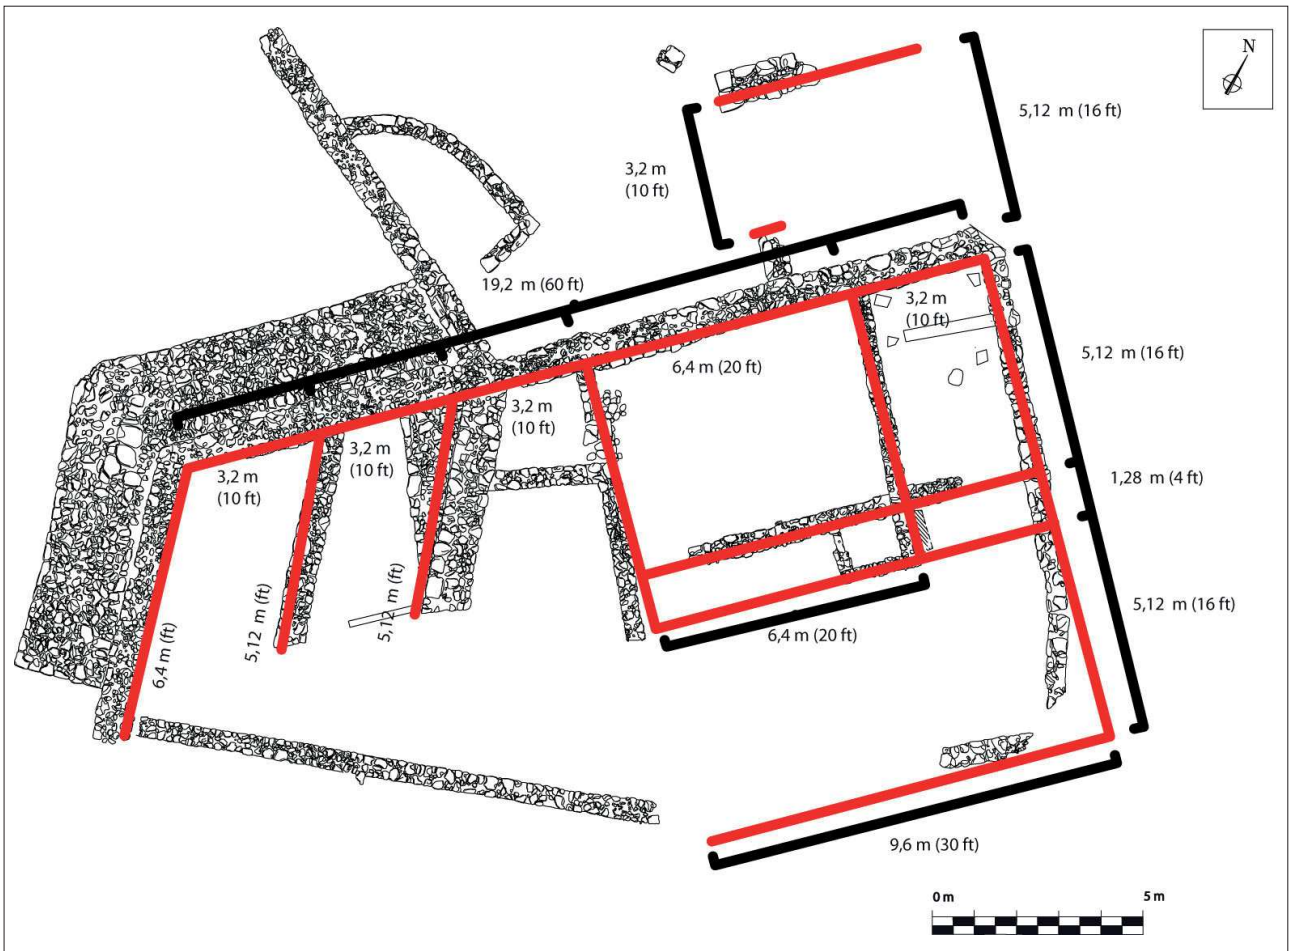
Plan of Building A and proposed metrological interpretation based on the use of 0.32 m as the unit of measurement.
